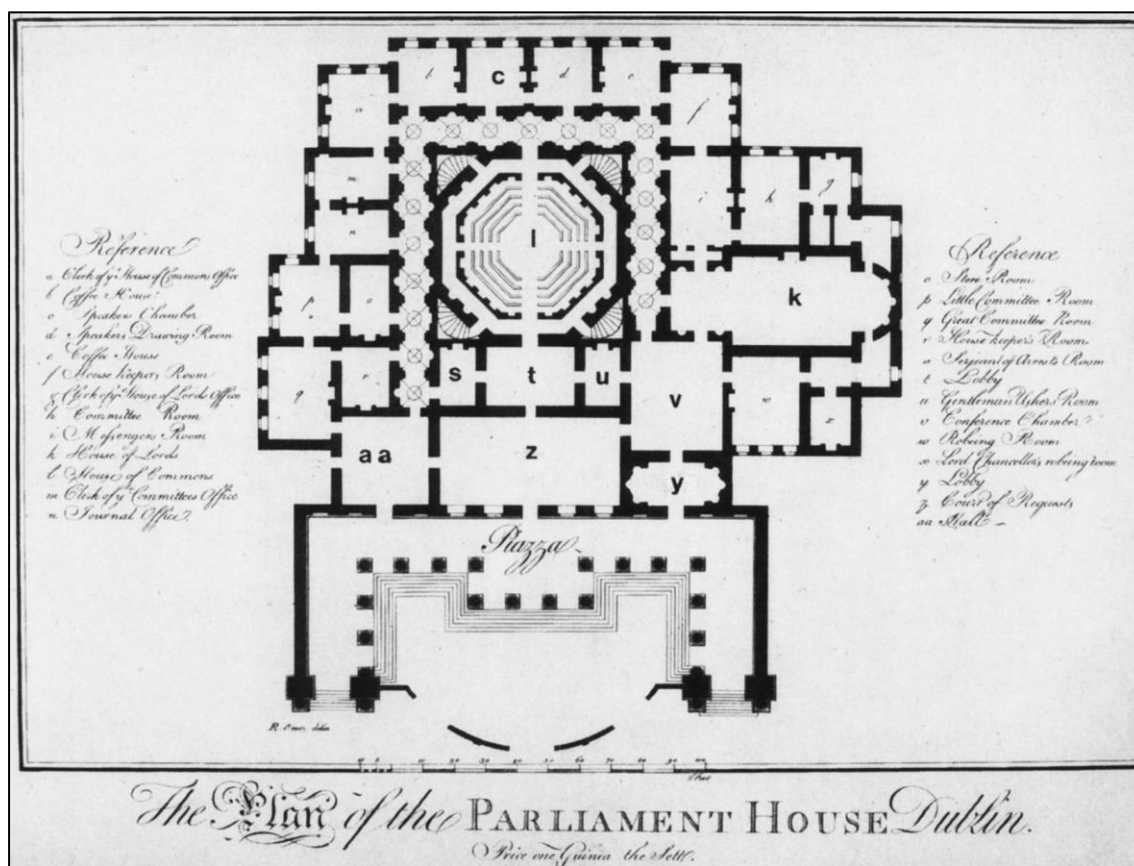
Parliament House, Dublin, engraved ground-floor plan, 1767⁴⁴
